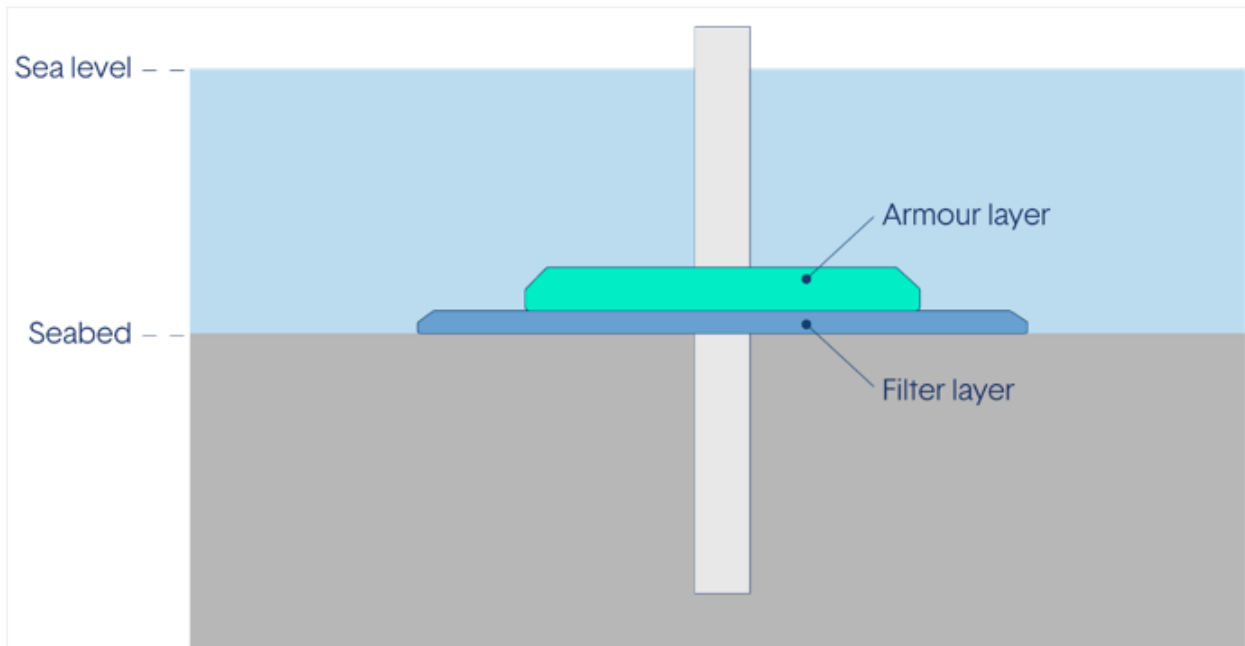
Illustration of a typical protection layer for a monopole foundation.
